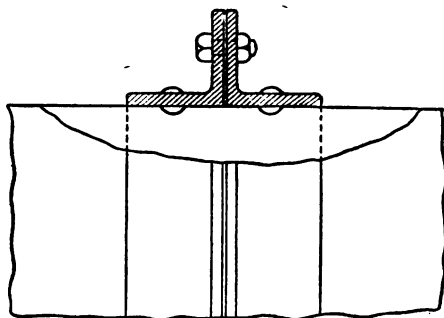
Girth Joints for Rectangular Sheet Metal Ducts
